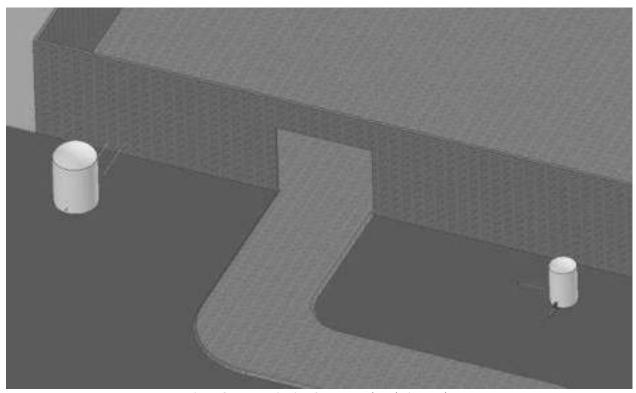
Isometric View Storage Tank and Dirty Tank
